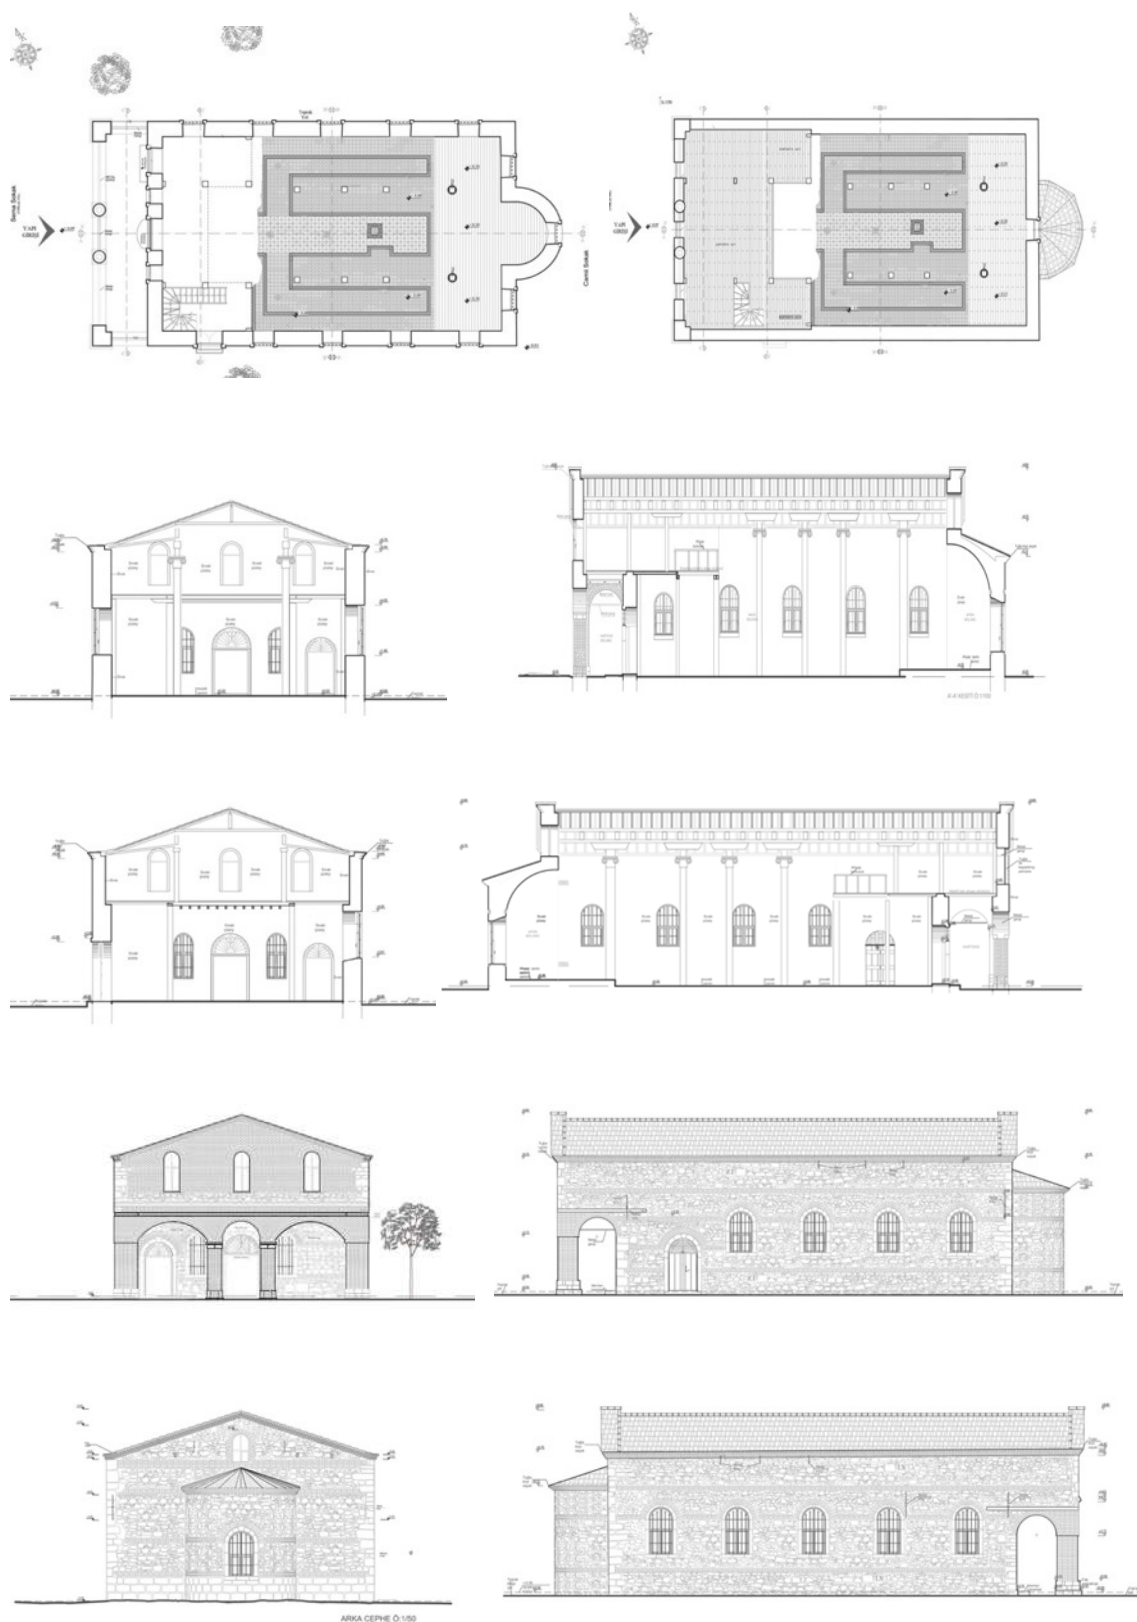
Restitution drawings of the church period: plans, sections, and elevations with drawing scale of 1/100 (authors' archive).
